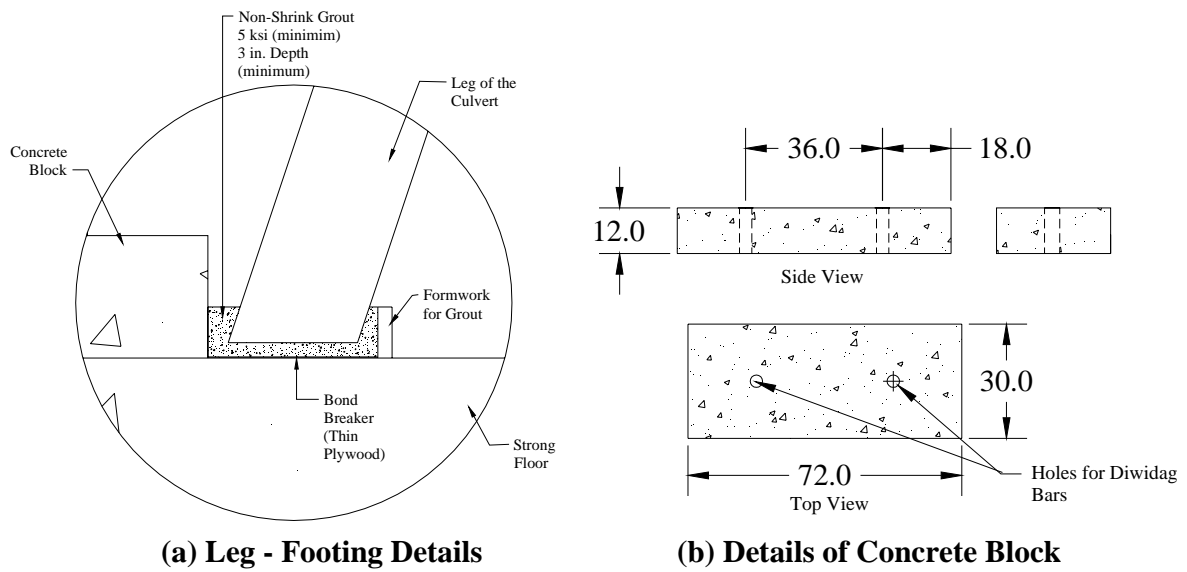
Details of the Procedure to Simulate the Grout Between the Legs and Footing in the Laboratory (North Side)
